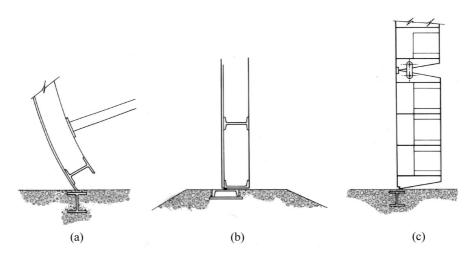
Unsuitable arrangement of structural stiffening members at the bottom section of gates
